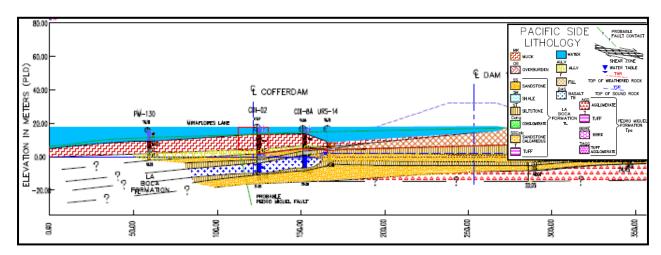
Cross section at station 3P+778.71 (tie-up station)
